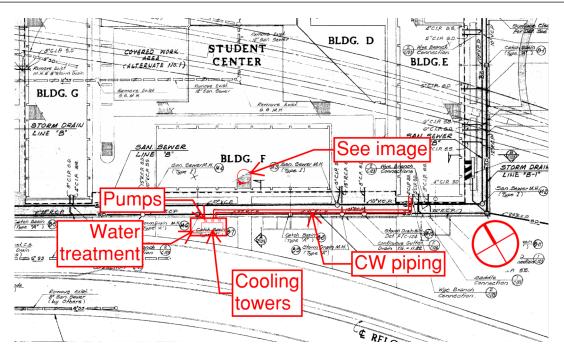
Plan view of potential cooling tower location adjacent to Building F. Location 3.
